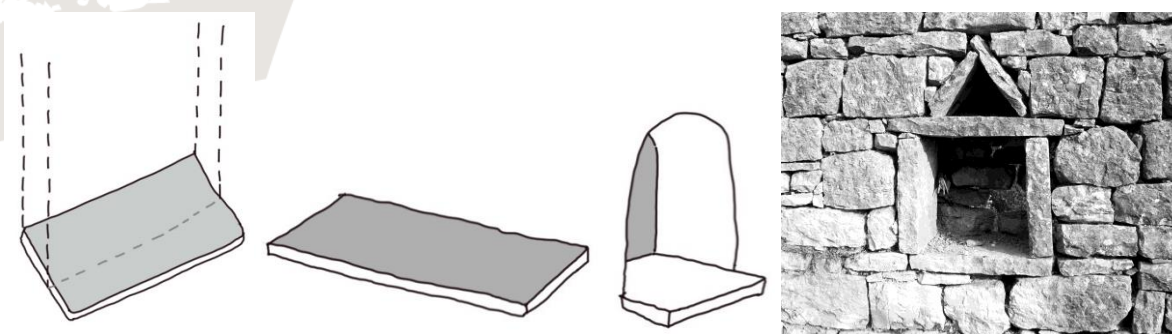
Window shelf and shading plate. Sketch and photo present two examples of niches in the wall. Stones in the shape of triangle redirect the weight along the vertical stone plates.
